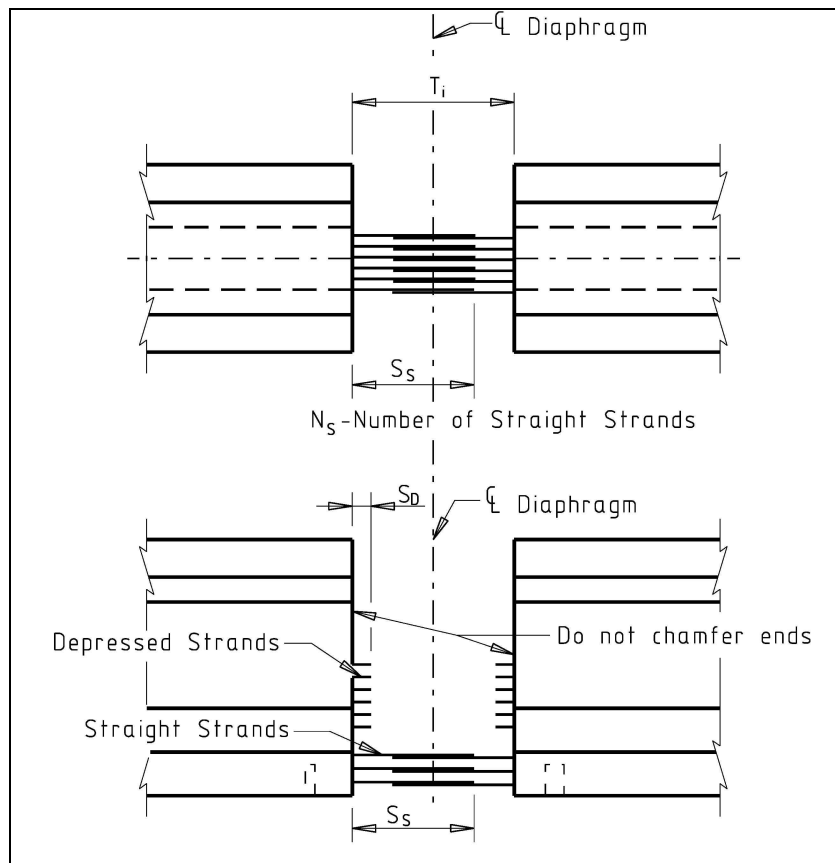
Plan and Elevation Views of Connecting Beam Ends Using Straight Prestressing Strand Reinforcement
